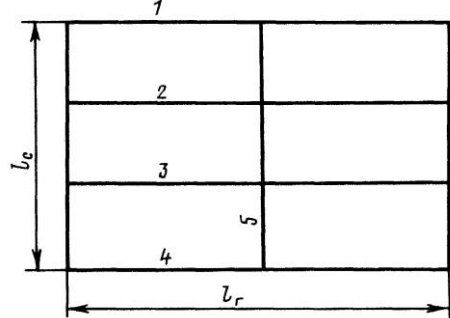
3-2. Plan of the grillage with two horizontal girders:
